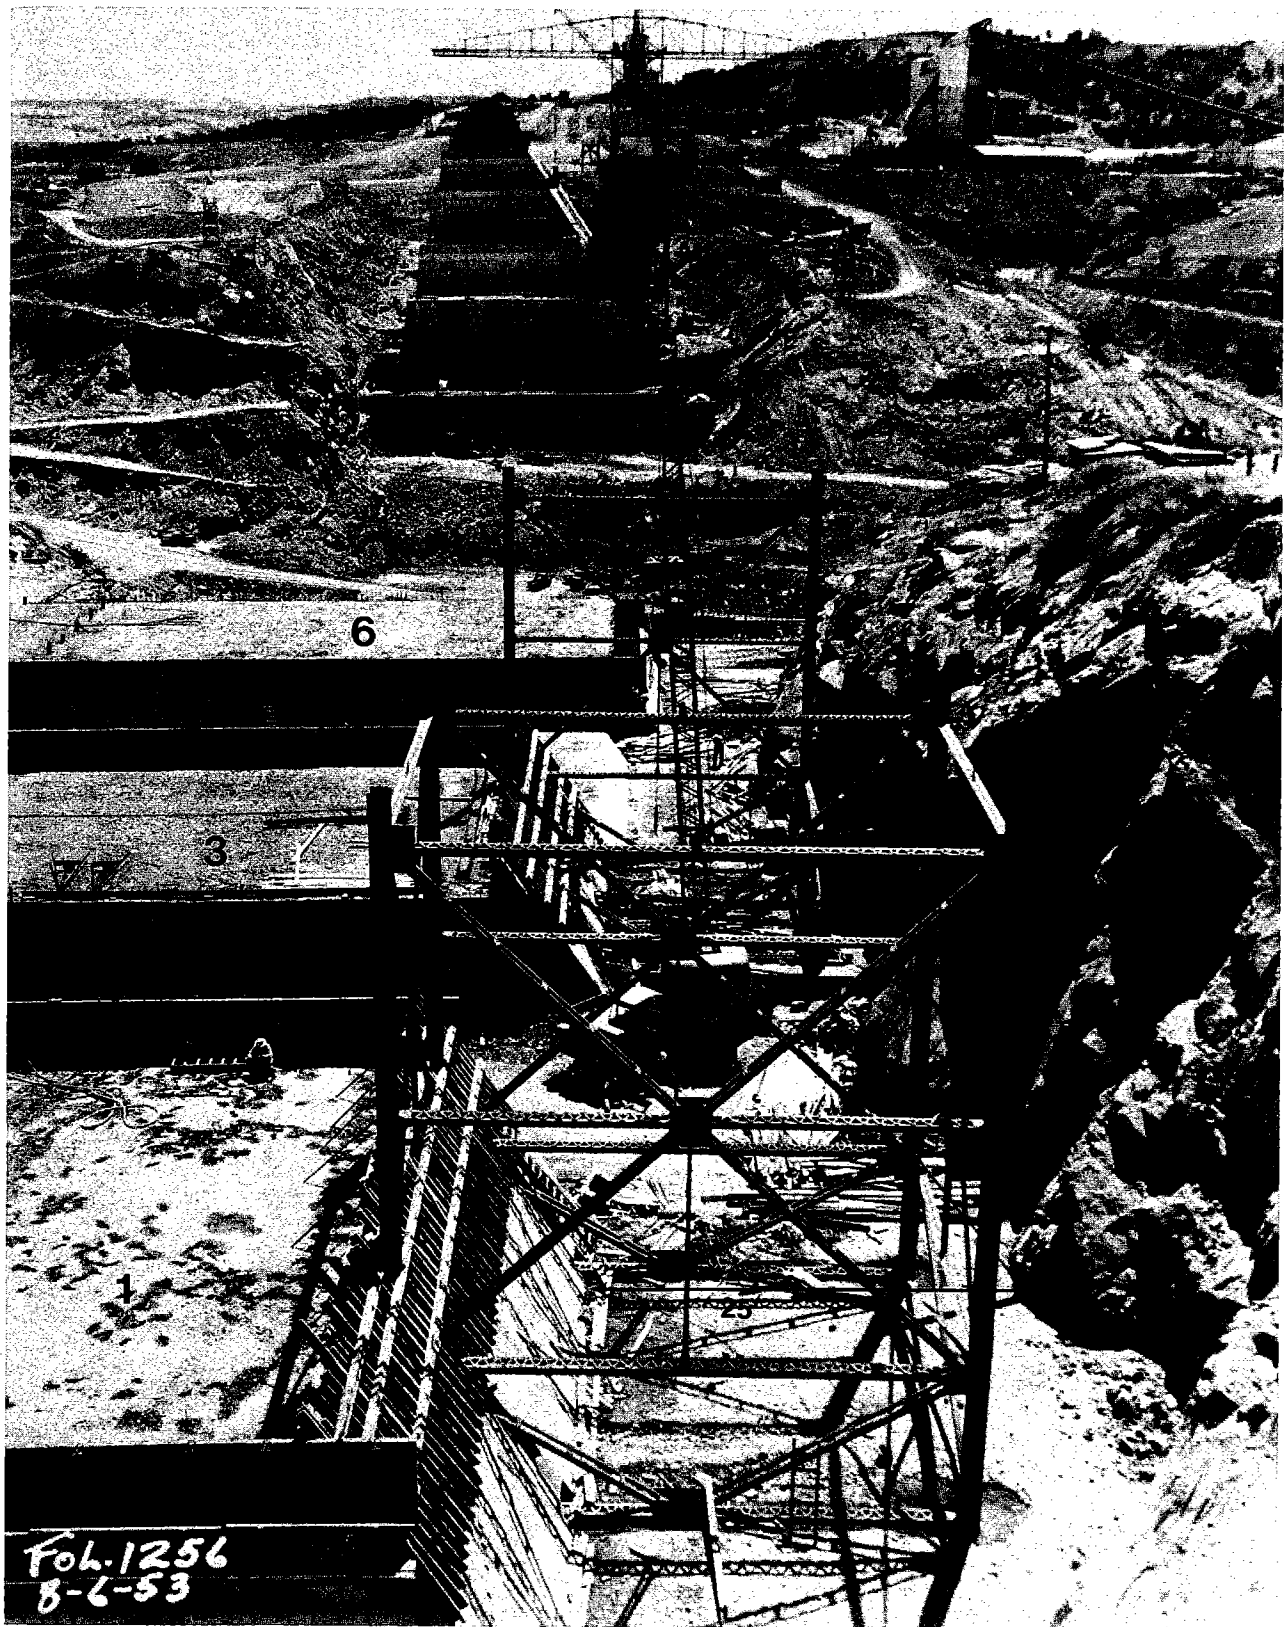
Construction photograph FOL. 1256, dated 8/6/53 showing geometry of rock trench at base of enveloped concrete monoliths, Right Wing Dam
